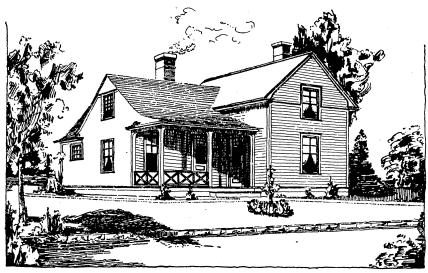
,-A \$600 farm house with \$500 addition. (Design No. 1.)
